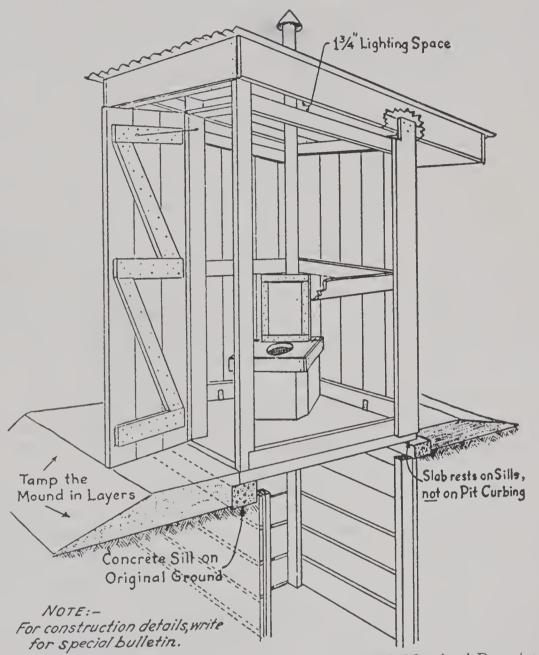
Sketch of pit privy. (Courtesy, George L. Hall, Maryland Department of Health.)
